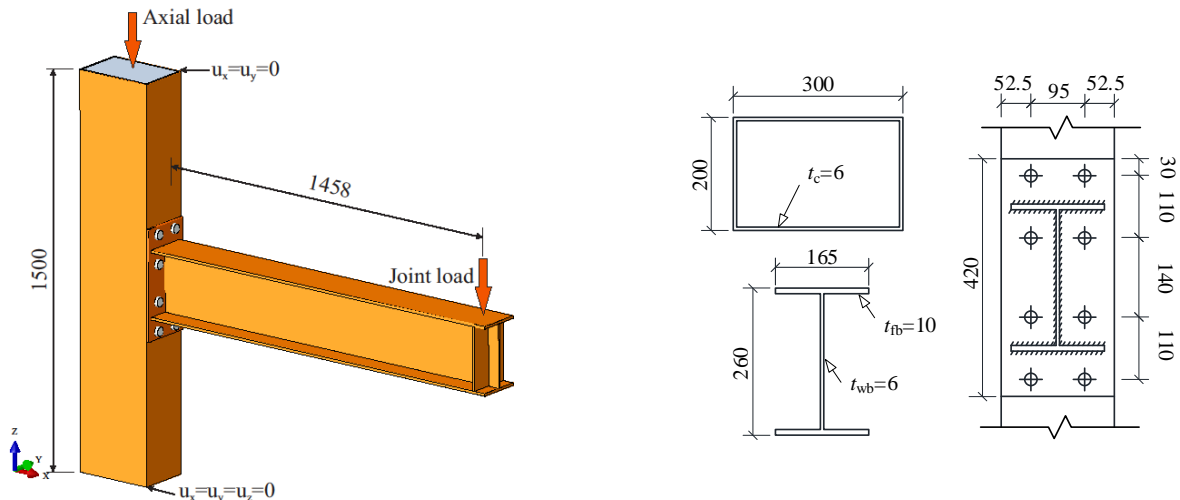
Geometry details of stainless steel joints (Unit: mm)
